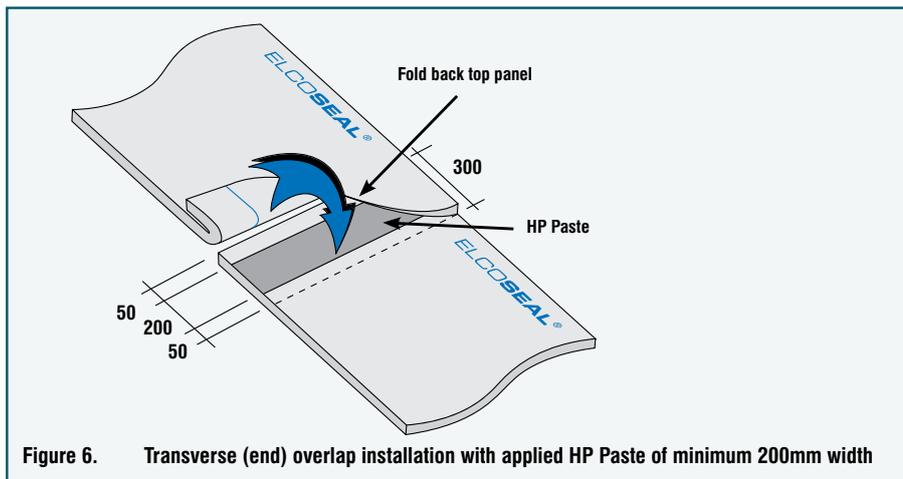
Transverse (end) overlap installation with applied HP Paste of minimum 200mm width
